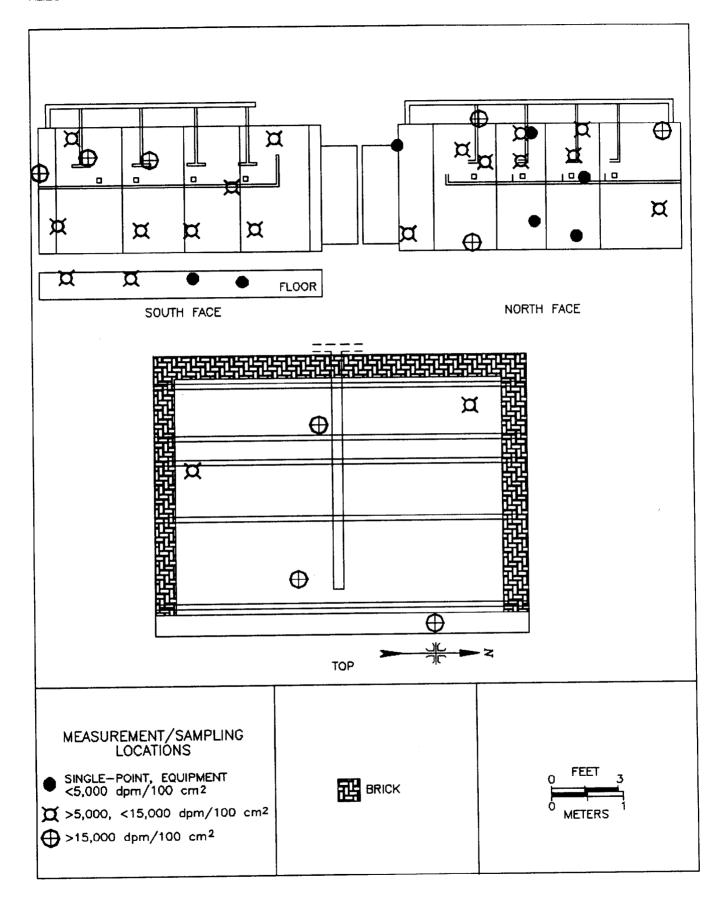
Building 3, West Furnace — Measurement and Sampling Locations
